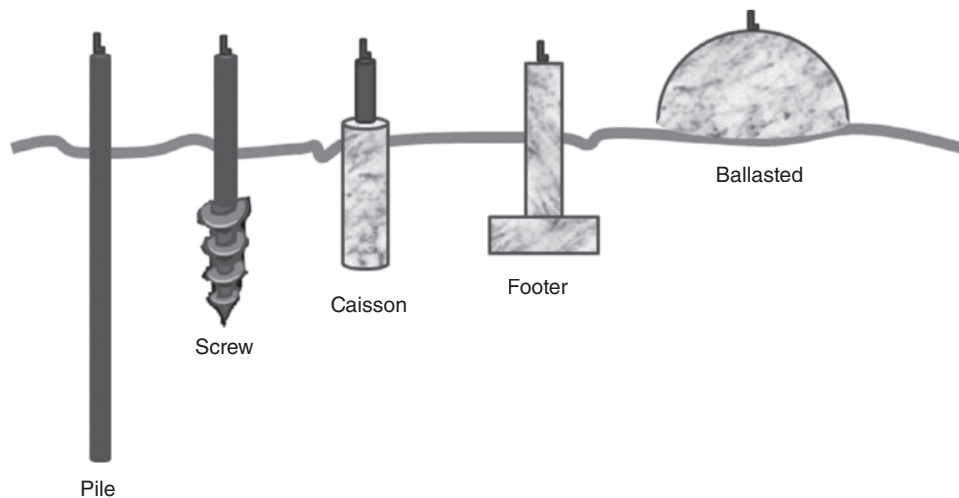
A variety of foundation alternatives are available depending on the size of the array, soil conditions at a site, and whether digging into the surface is prohibited. (Figure by the author)
